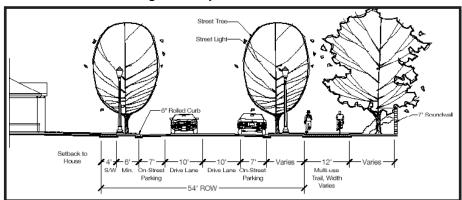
Neighborhood Street at Parkway - Woodbridge by Del Webb, Section P
